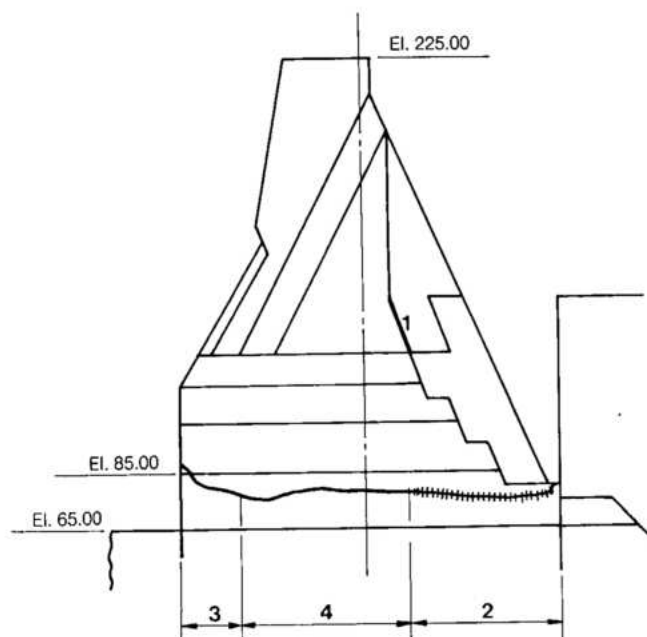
Model 3: crack pattern for 1st and 2nd test for failure
